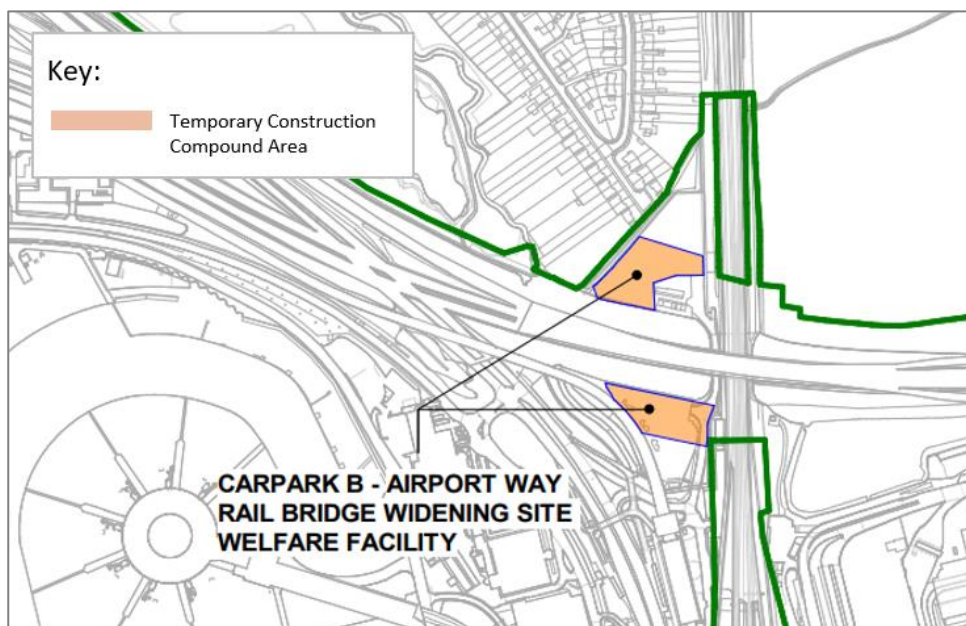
Site Context Plan - Car Park B Site Welfare Facility
